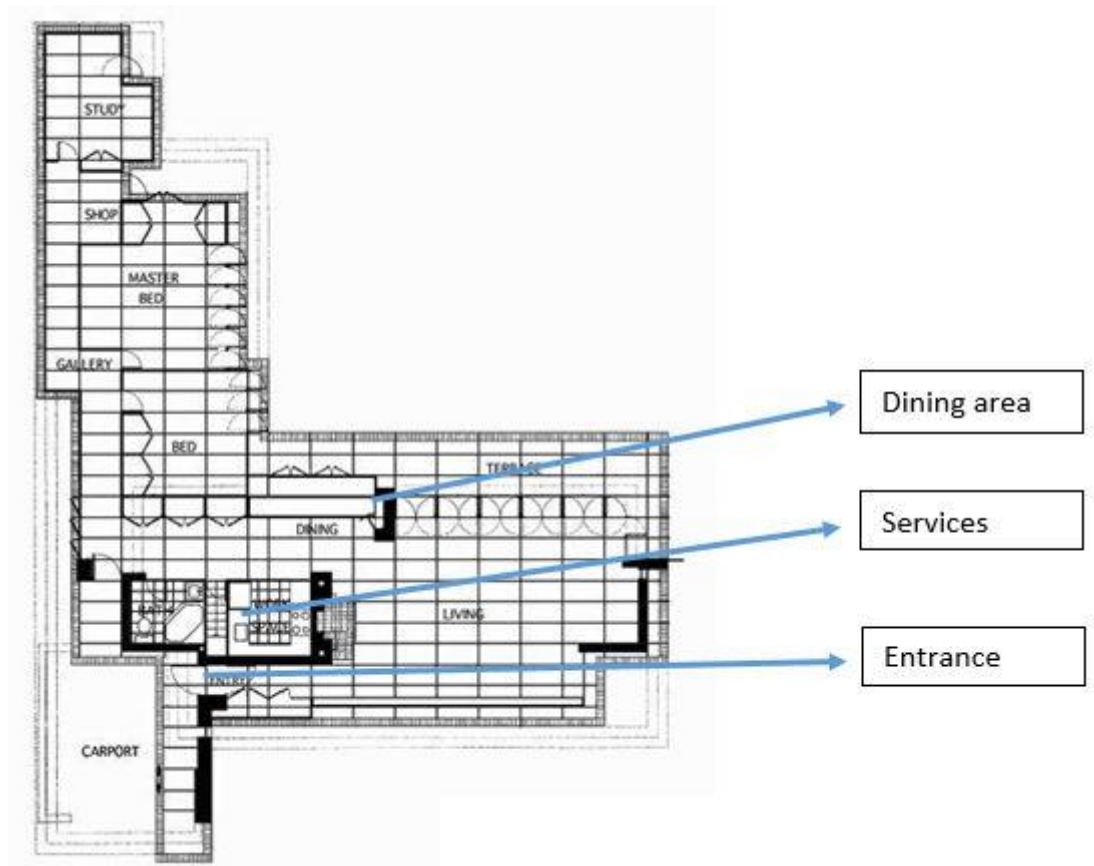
Permanent dividers in Jacobs house plan (Twombly, 1979).
